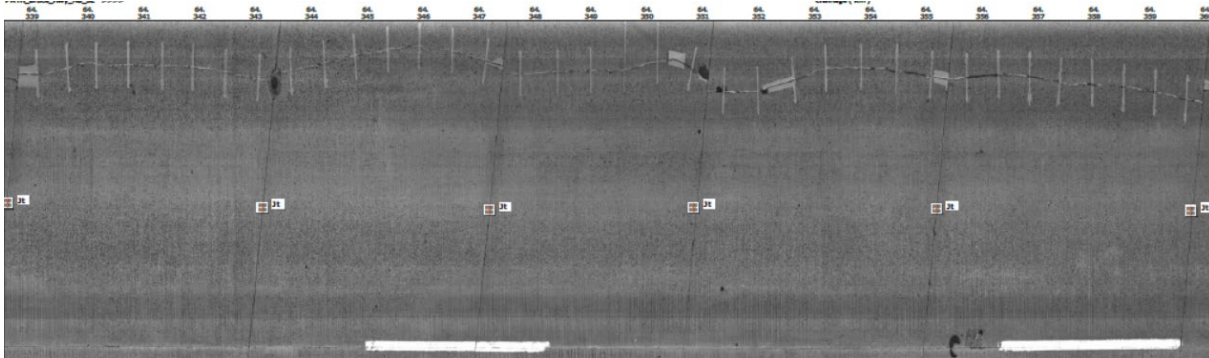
(e) – Staple tie bar repair at concrete pavement of Bruce Highway on Sippy Downs – northbound slow lane from approximately Chainage 64.339 km to 64.360 km
